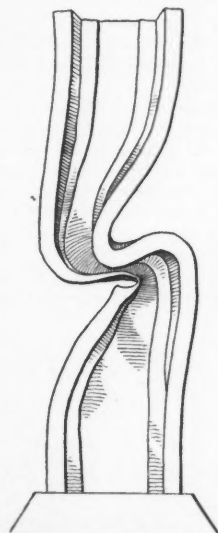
Sketch of Column Distorted by Heat and Impact in Warehouse Fire at Pittsburg, Pa.
